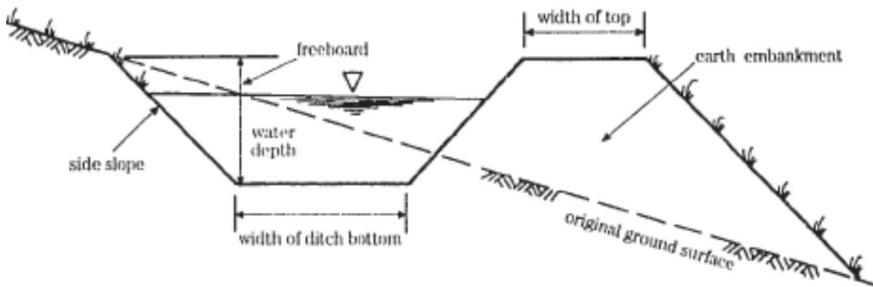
Cross section of a trapezoidal cut-off drain⁴³
